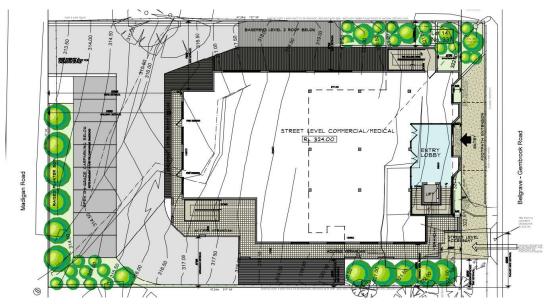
Ground Floor to Belgrave- Gembrook Road.
